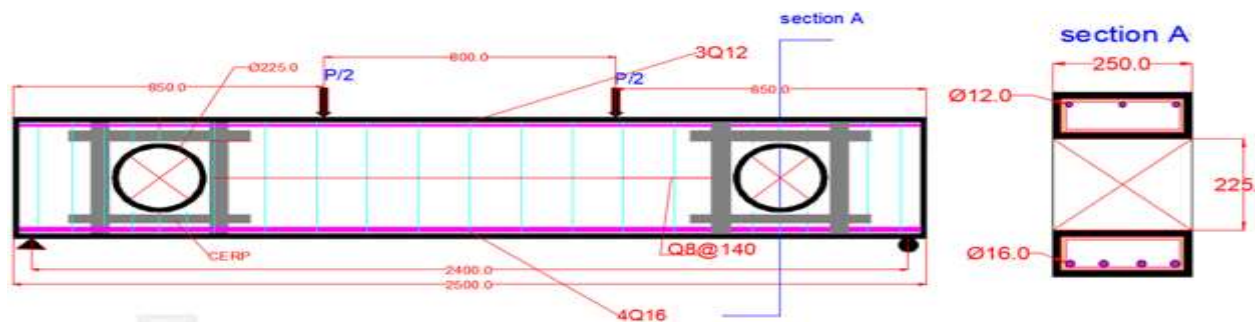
Detailing of beam with two circular opening strengthened with CFRP.
